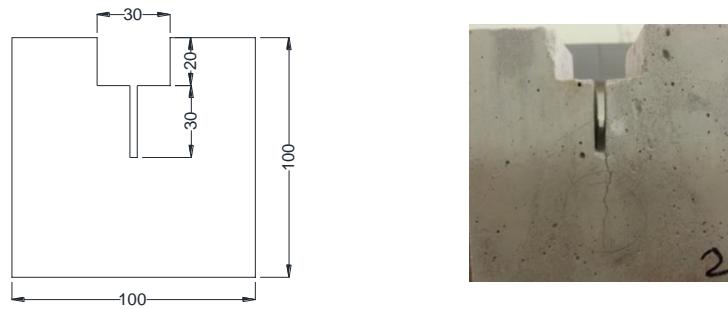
WEDGE SPLITTING SPECIMEN: DIMENSIONS (LEFT) AND PHOTO (RIGHT).
